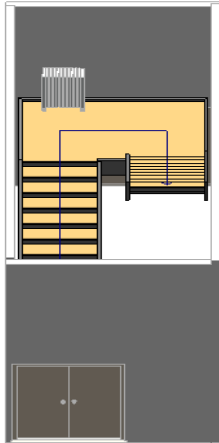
3D BIM Revit Model showing internal stairs at University of East London
